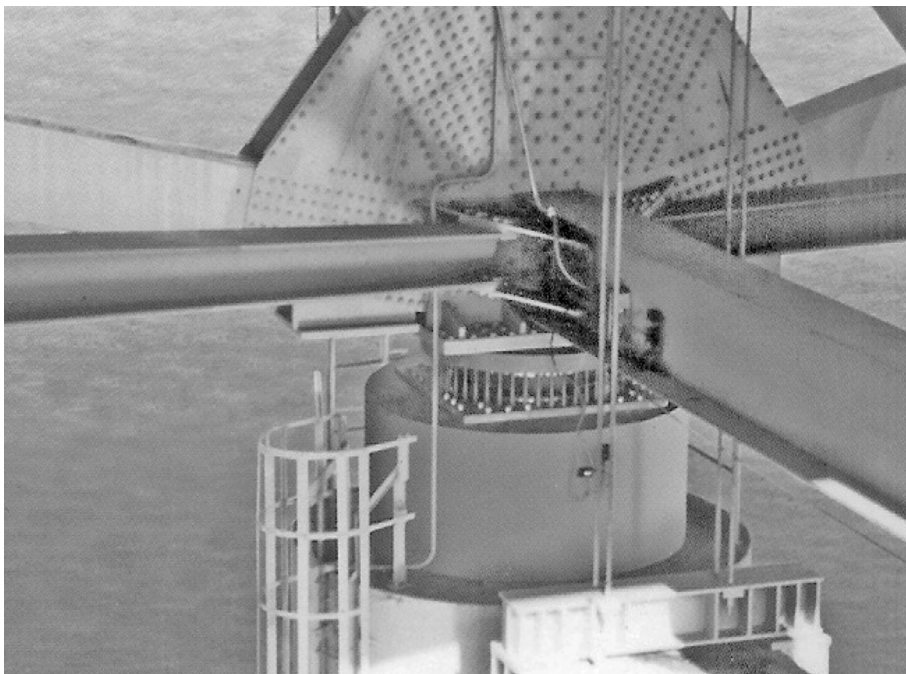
The hysteretic bearing installed at pier 3 of the Marquam Bridge. Image courtesy of the Oregon Department of Transportation
